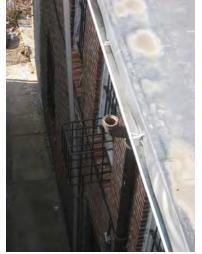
Aluminum gutter at lower roof. (Photo: BBB, 2007)
